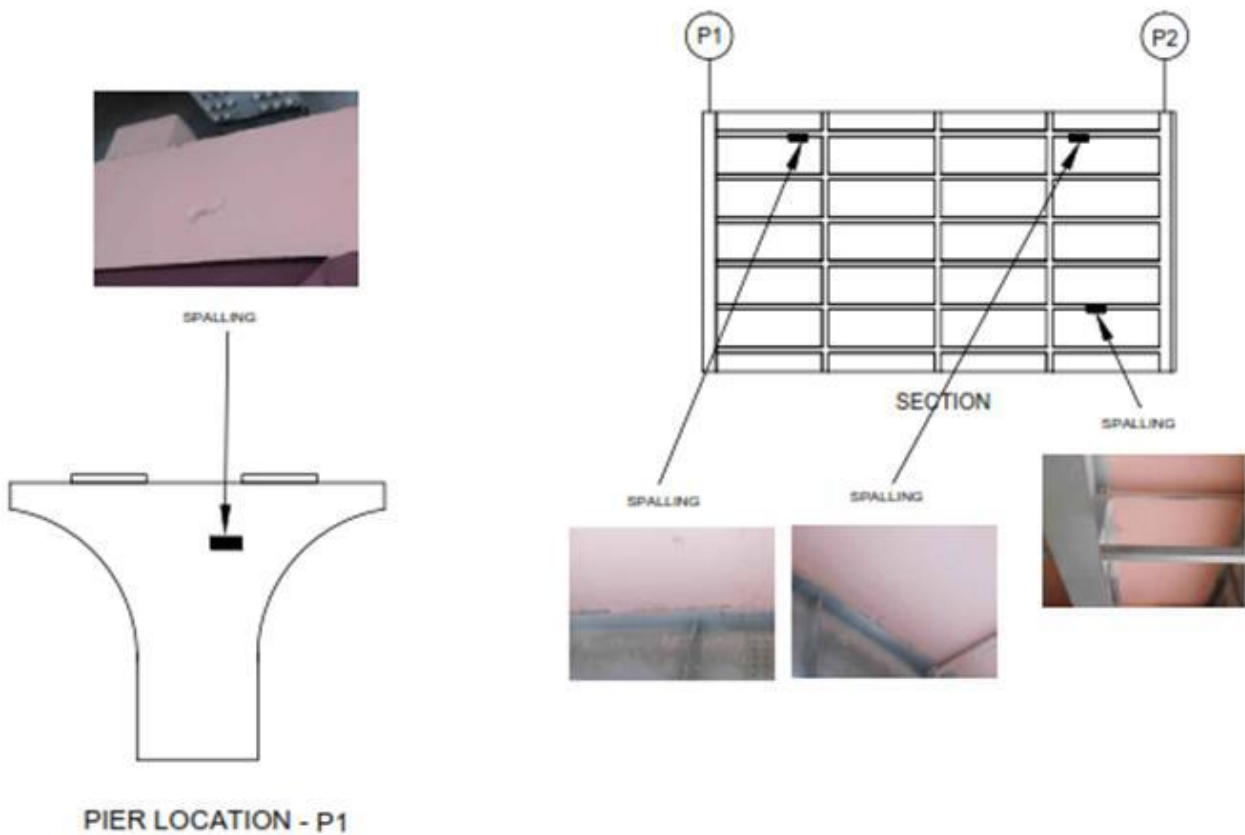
Spalling of concrete near the junction of girder and panels between P1-P2
